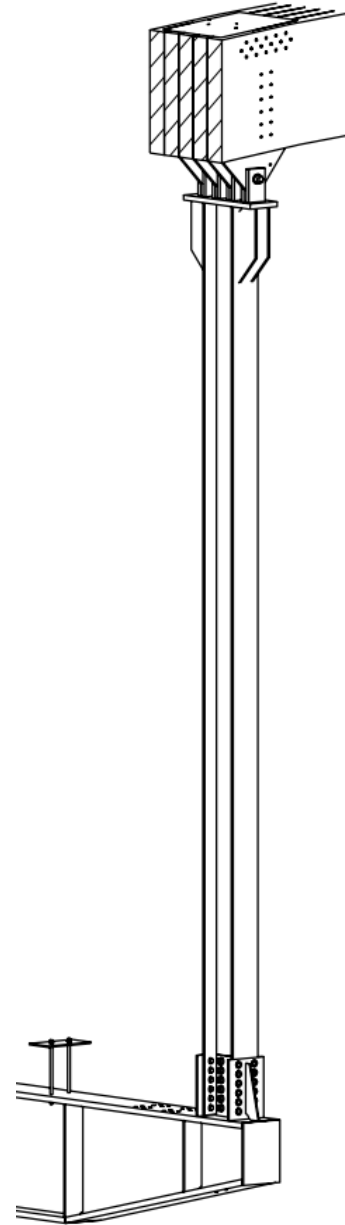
Detail showing the hanger with connection to the arch and the transverse girder. The increasing depth of the girder is shown. The bolts preventing separation between the deck and the girder are also shown.
